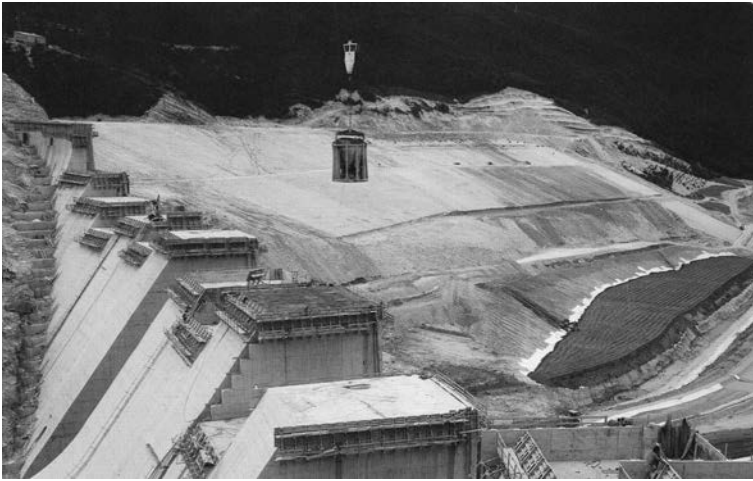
The Castreccioni dam (Italy), with upstream waterproofing works (construction stage).
